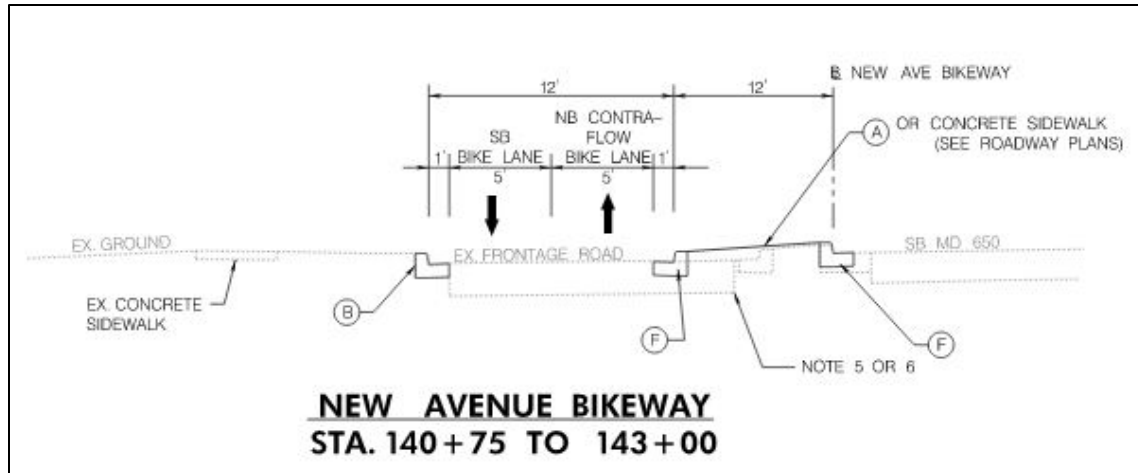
Separated Bike Lanes between Holton Lane and Kingwood Drive – Proposed Cross Section
